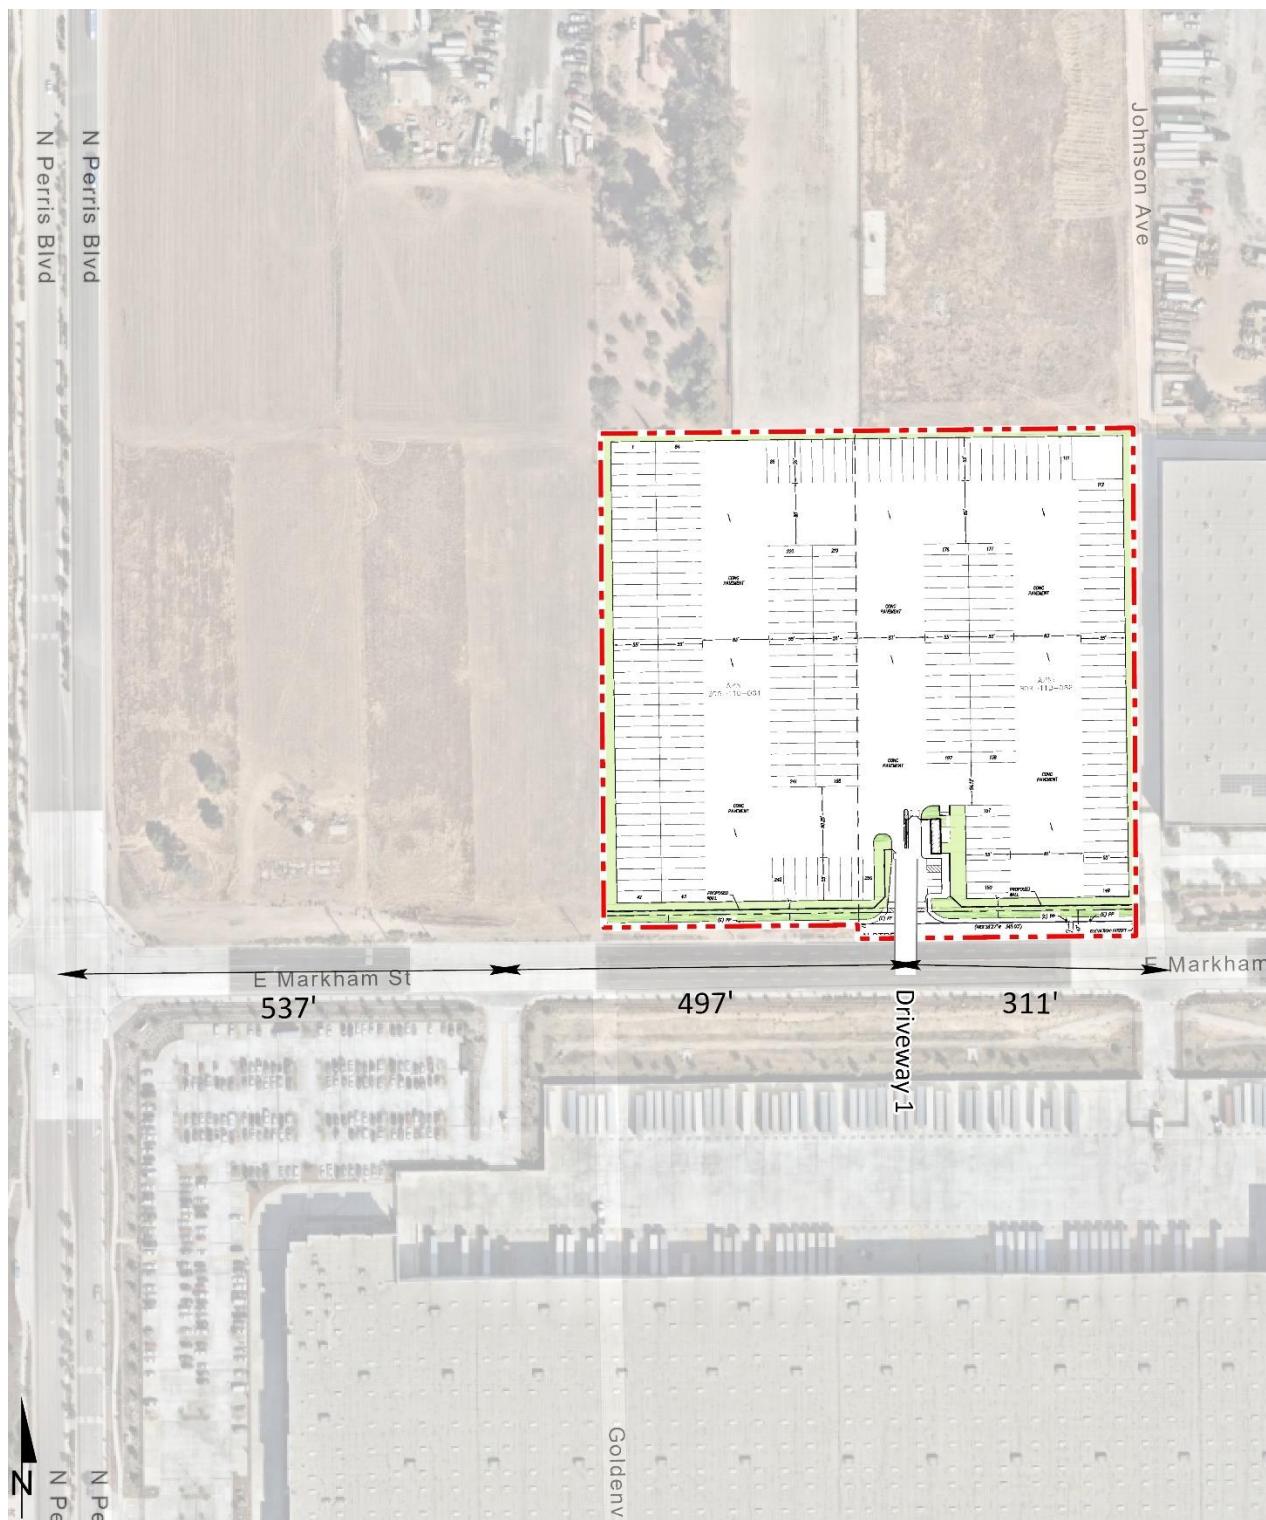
B: PRELIMINARY SITE PLAN
